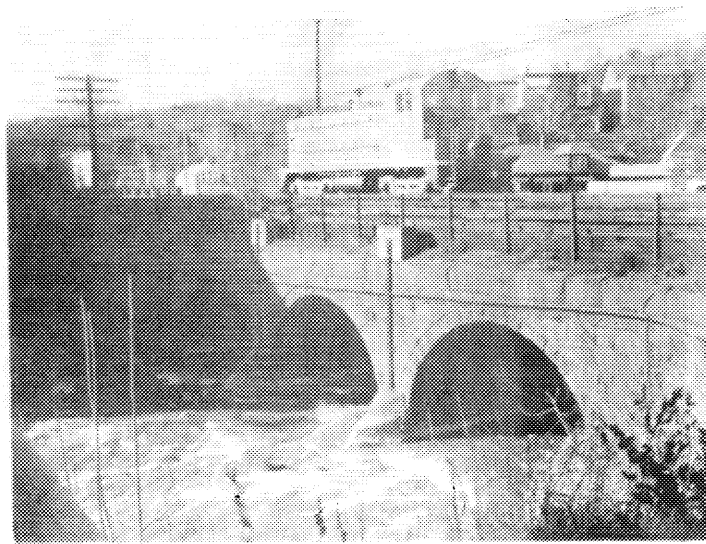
Boston and Maine Railroad Bridge at Station 554+00.
